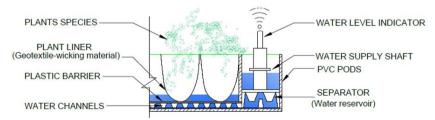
Biofacade construction detail (Source: Fadli, Bahrami, & Zaina, 2018).
